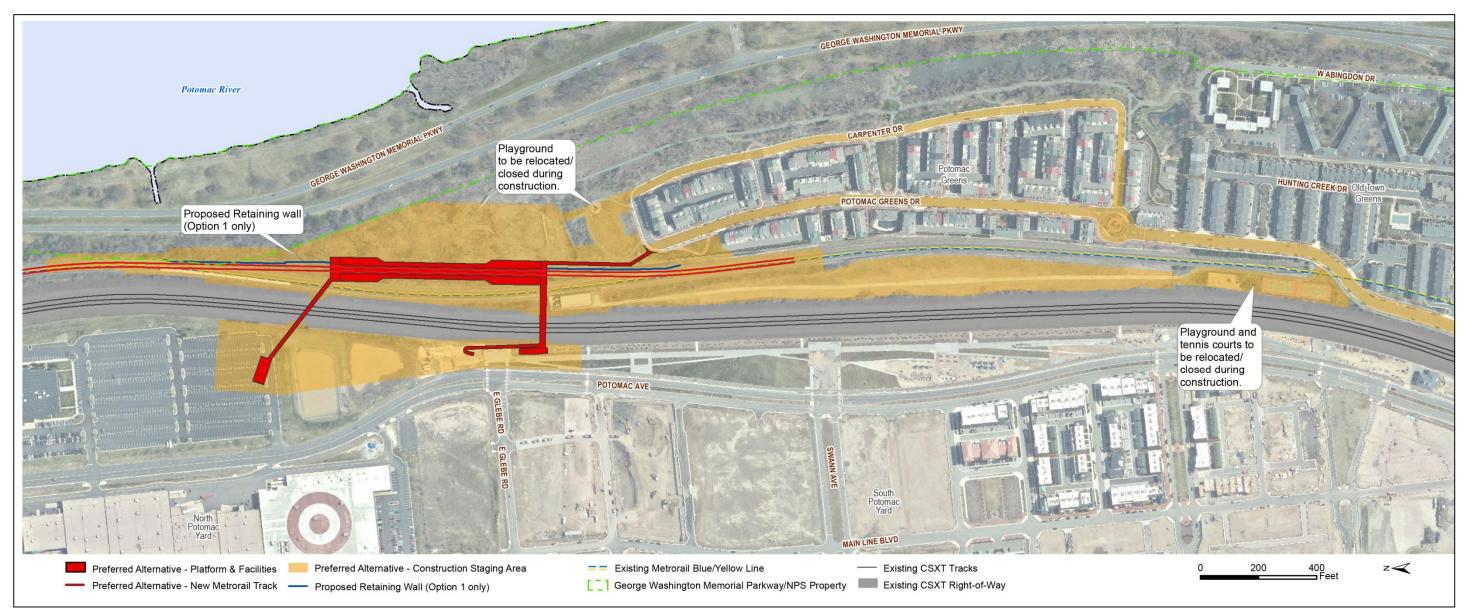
Preferred Alternative (Build Alternative B, Option 2 Construction Access).
